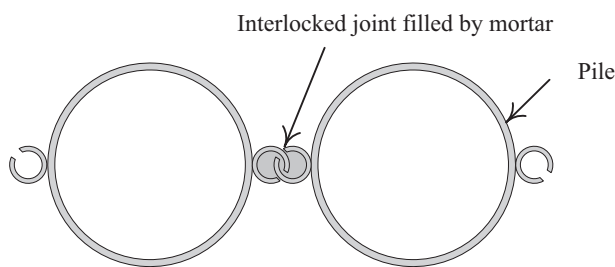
Cross section of steel pipe sheet piles (SPSPs).
